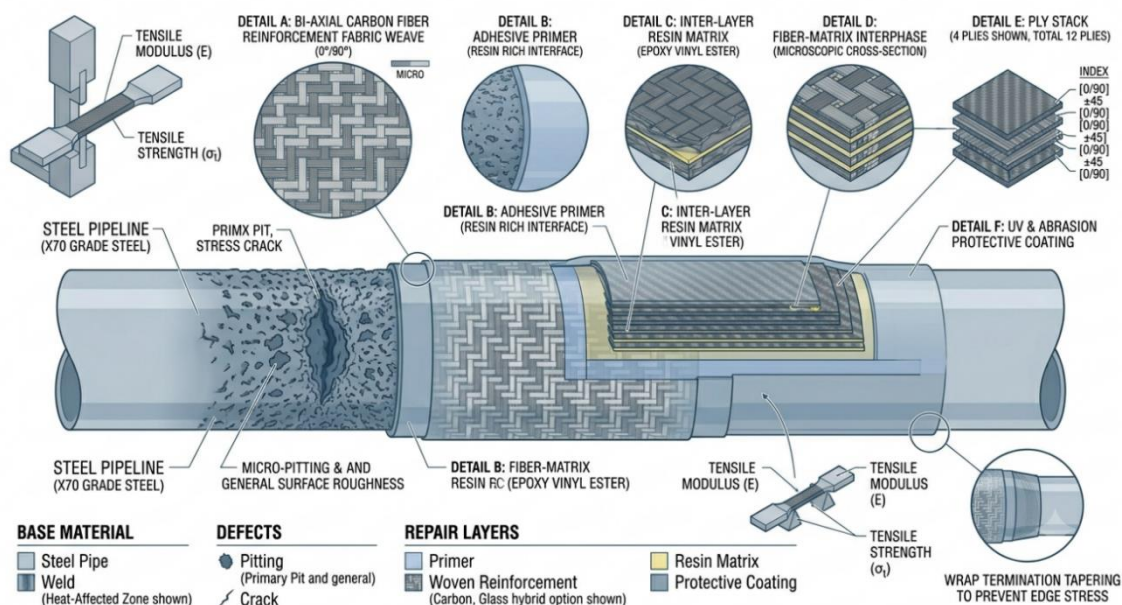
Composite Pipeline Repair Wrap for Surface Defects and Cracks
